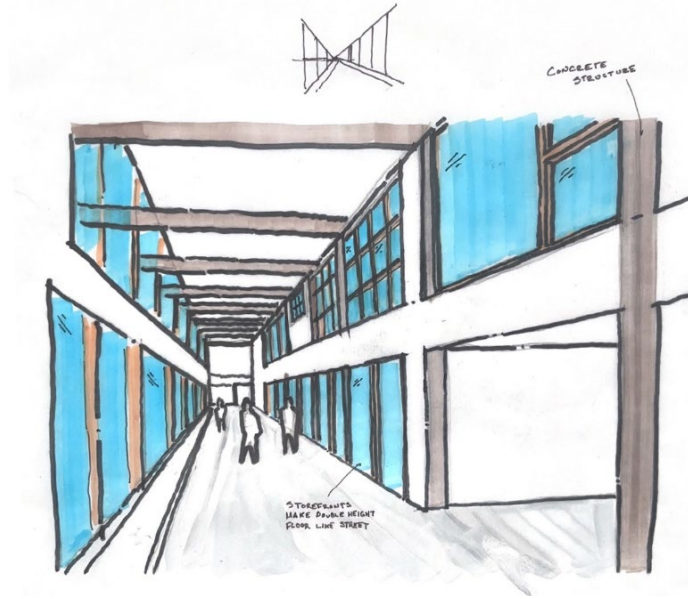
A rendering of the double-height retail floor. Image Credit: Author
